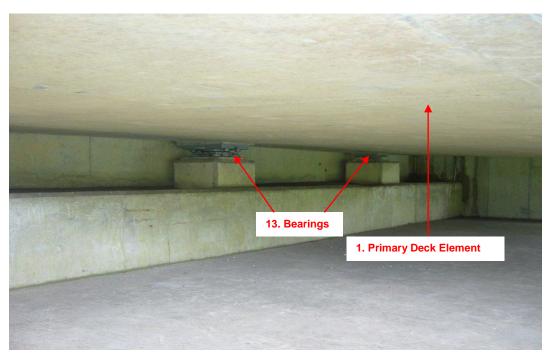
Thundery Hill Bridge – View Showing Bearings and Deck Soffit
